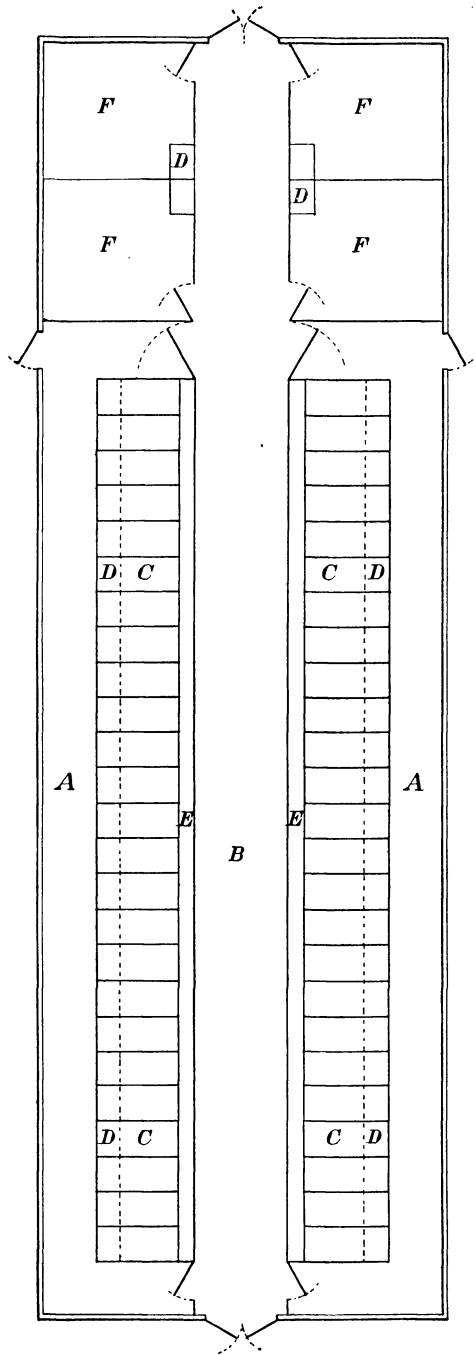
Ground floor plan of cow stable: A, feeding alleys; B, central passageway used in cleaning stable, etc.; C, stalls; D, mangers; E, manure gutters; F, box stalls.
